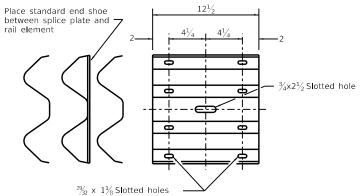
Plate A shall be placed between rail element and block-out at nonsplice mounting points only when steel block-outs are used.
